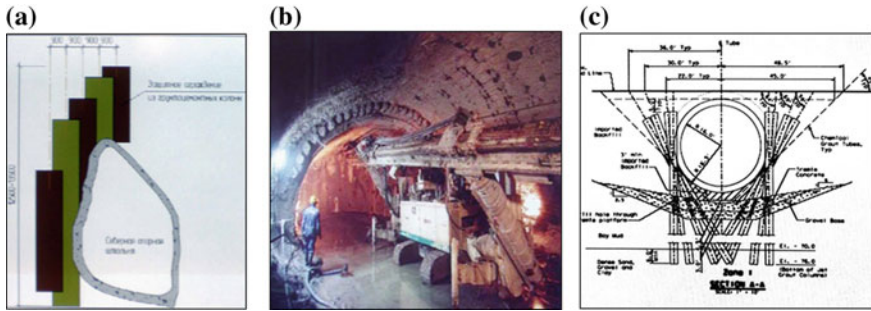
Soil improvement around tunnel by the jet-grouting technique: a vertical columns (Абрамчук et al. 2004); b horizontal columns (ROTEX OY 2006); c inclined columns (Dash et al. 2003)
